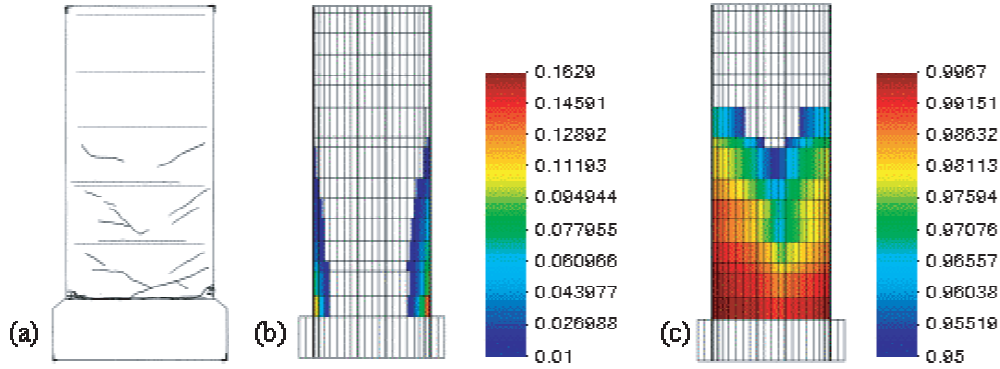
CAMUS III (multilayered beam element) — Cracking of the wall at the end of the experiment. (a) Damage Pattern: Due to Compression — crushing after $D_2 \approx 0.15$; (b) due to Tension — cracking after $D_1 \approx 0.98$.
